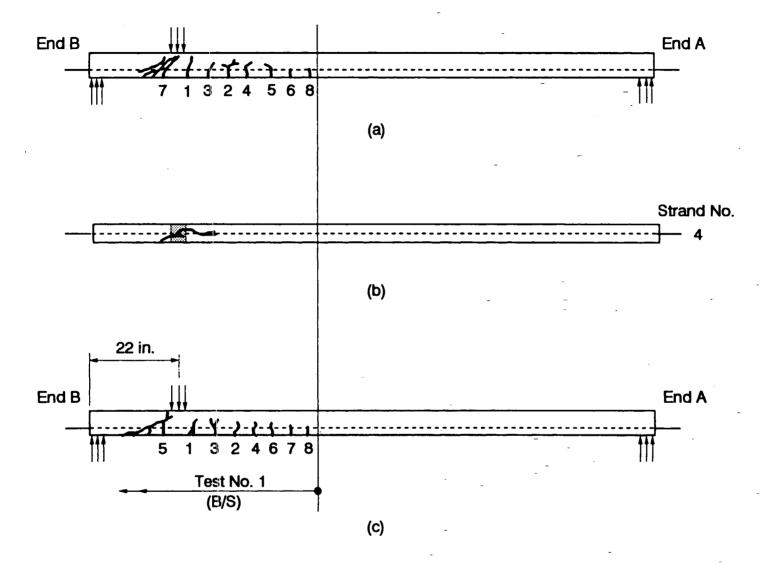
Crack pattern for D-type Specimen No. 17-6.0DC-4:
